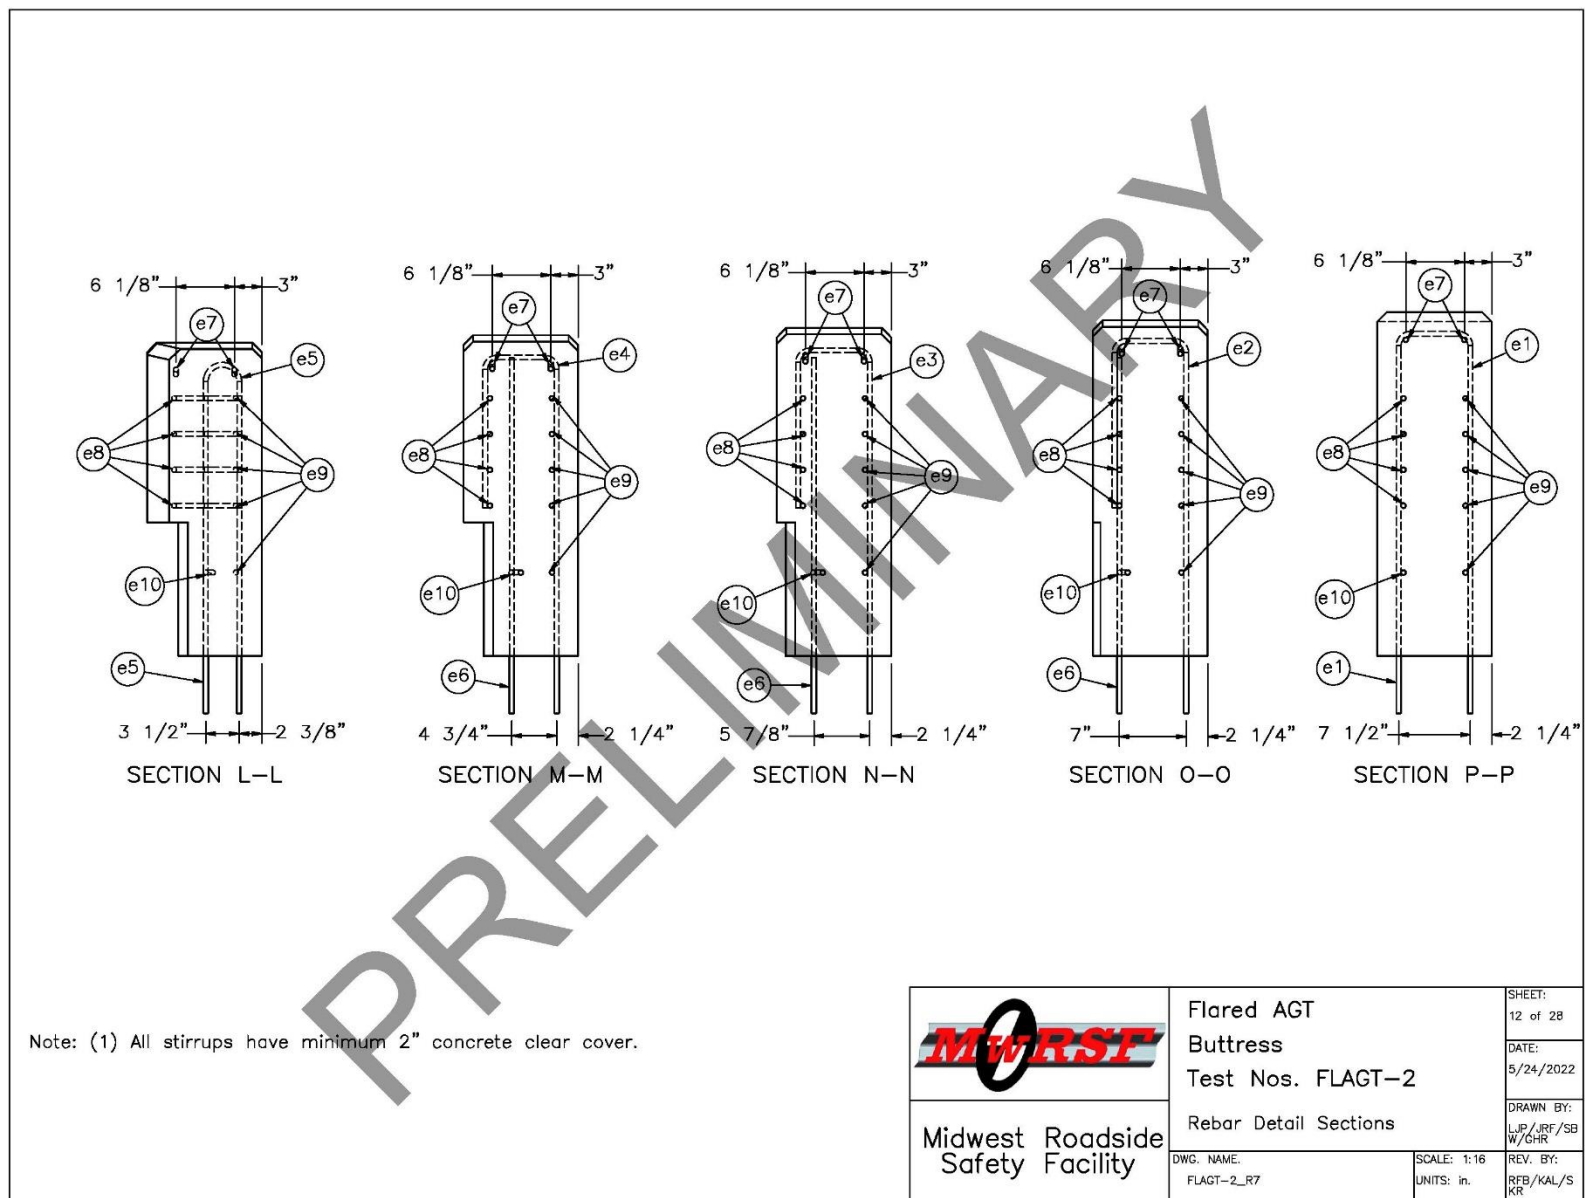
Buttress Rebar Detail Sections, Test No. FLAGT-2
